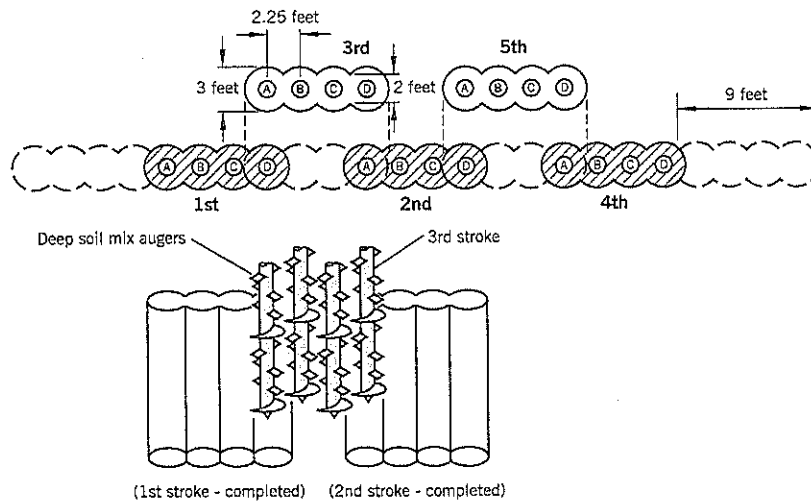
Installation technique for constructing a soil mix wall (after Bahner and Naguib, 1998).
